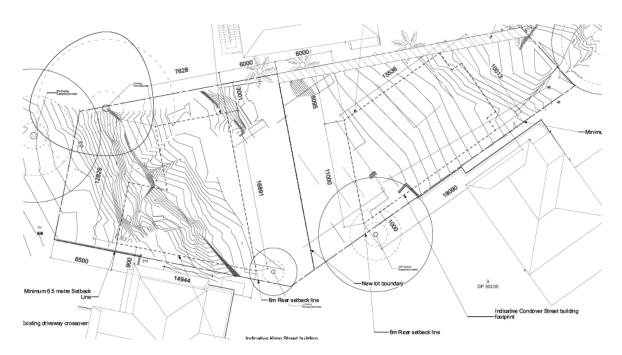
excerpt of the approved revision F indicative dwelling footprint plan DA05
